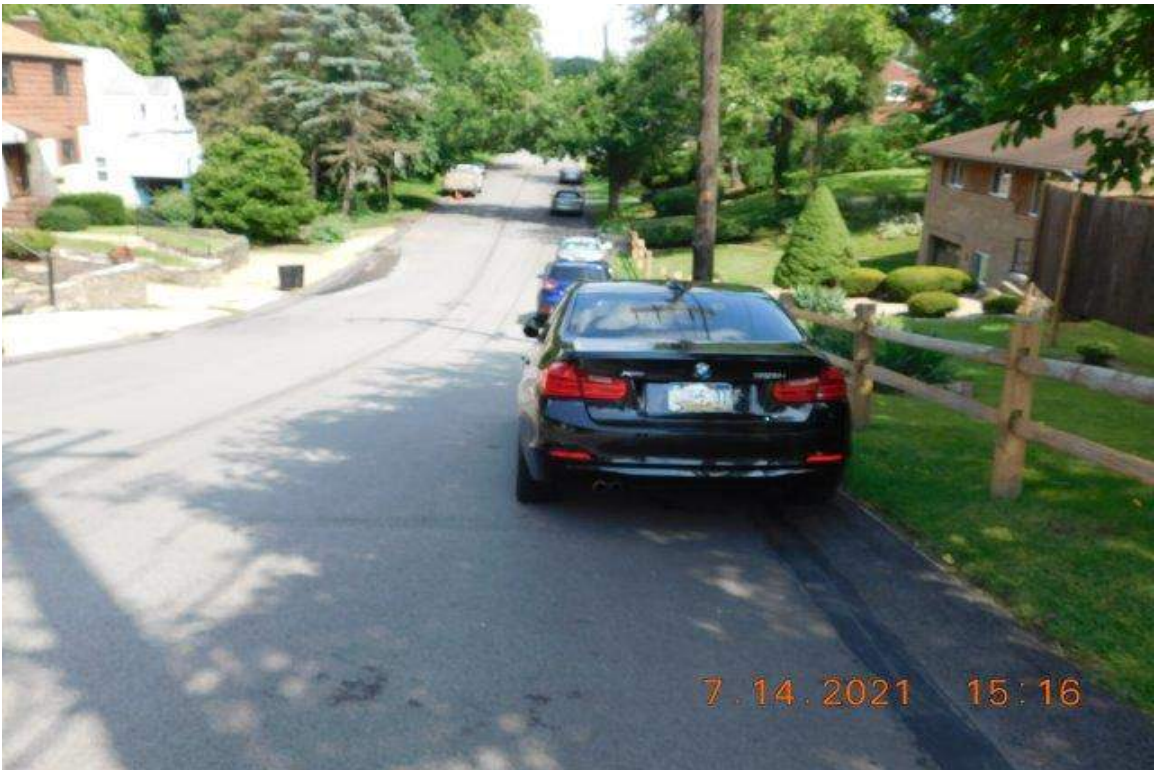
EAST MILLER AVENUE LOOKING EAST FROM HILL STREET
